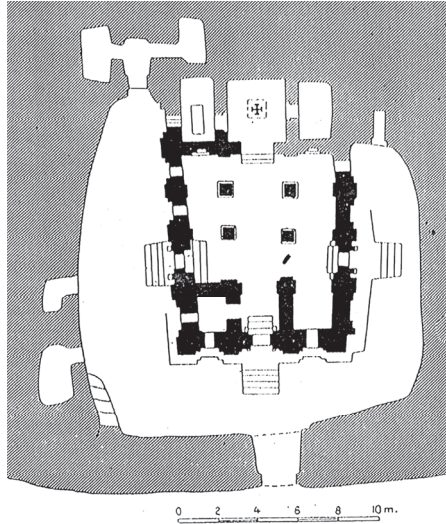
Church of Bilbala Qirqos, Wällo, floor plan; after Monti della Corte
